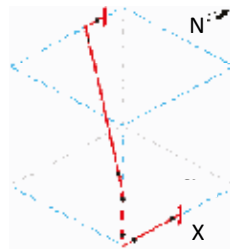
Isometric view of a pipe from one plant to opposite plane
